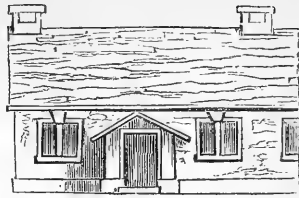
Road-side Cottage, with the addition of a Porch and covered Chimney Tops.
